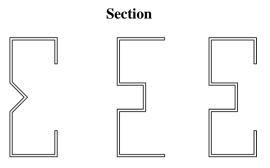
Specimens of cold formed steel channel section for the analytical work to prepare Column Section
